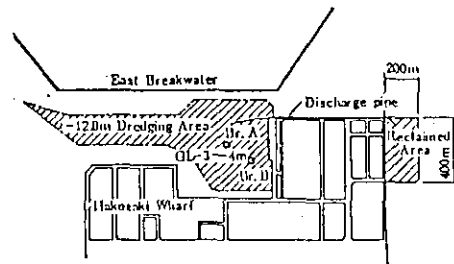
Dredge reclamation plan (Hakozaki)
